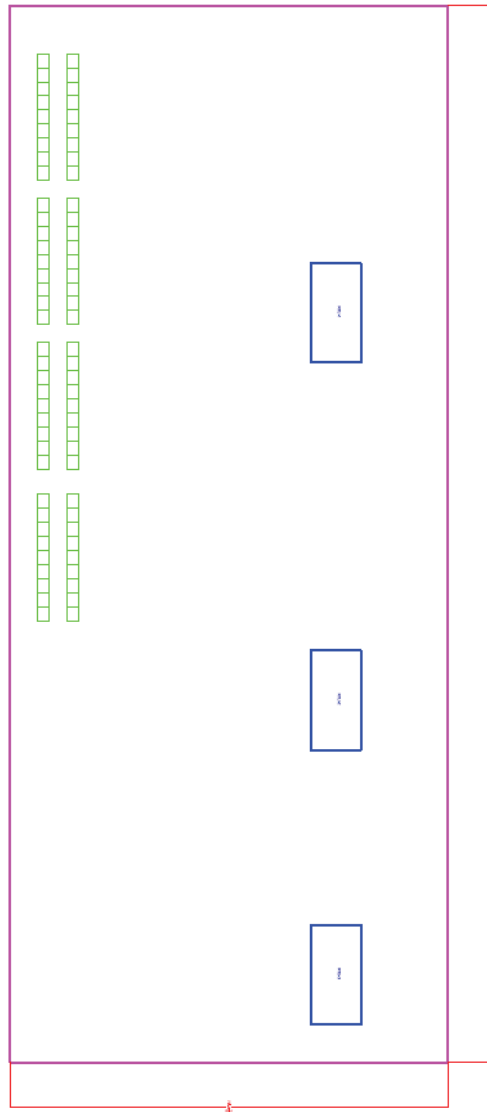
LOWER ROOF PROPOSED LOCATION FOR REMAINING PUMPS
